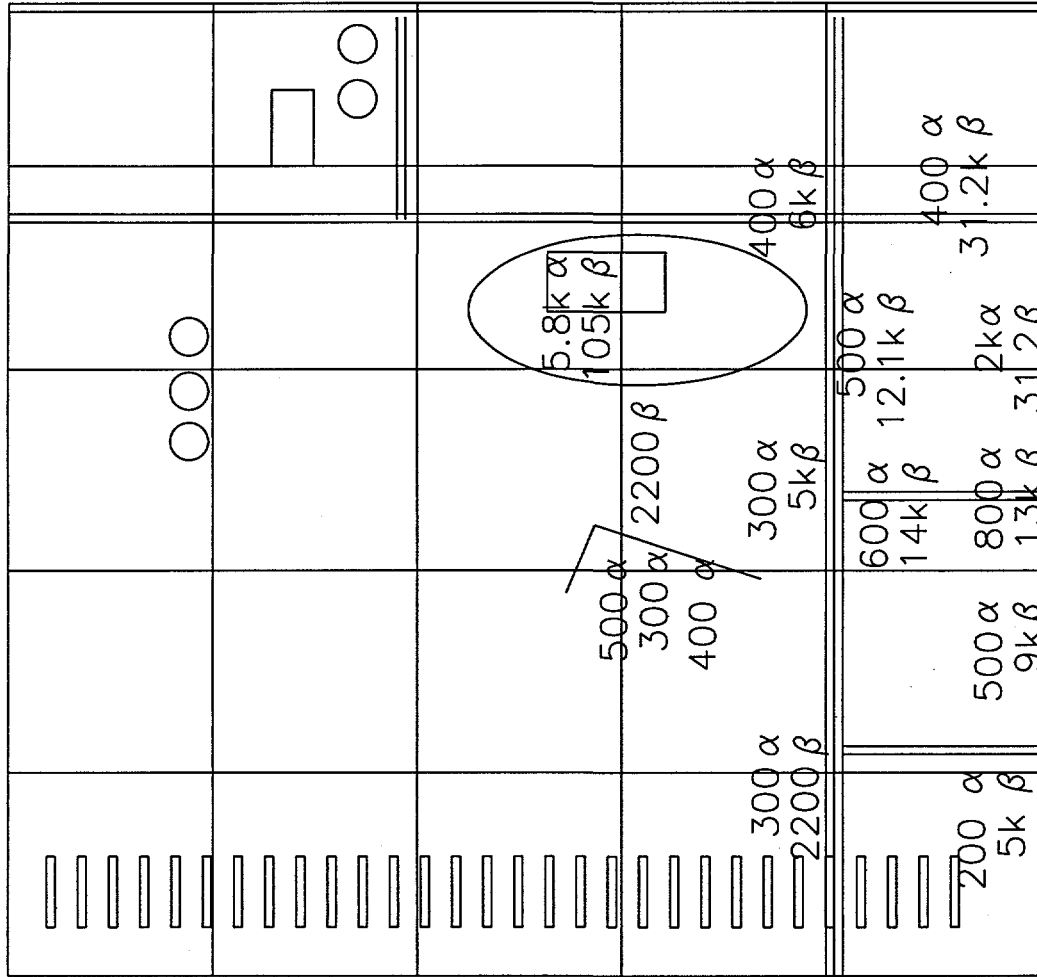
Building 310 Retention Tanks; Room 050 Floor under Tar Paper
